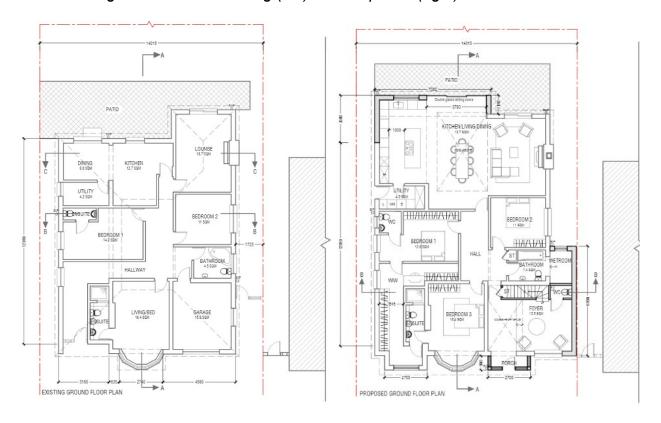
& 13 – Existing (left) and Proposed (right) ground floor plan
